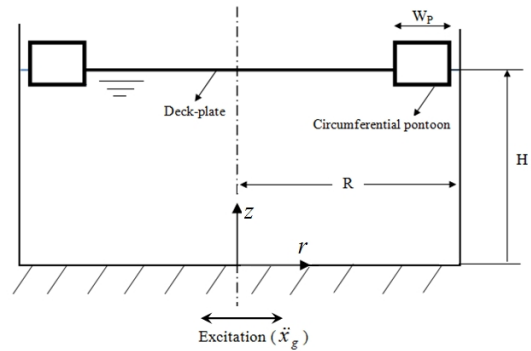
Cylindrical liquid storage tank with a single deck floating roof
